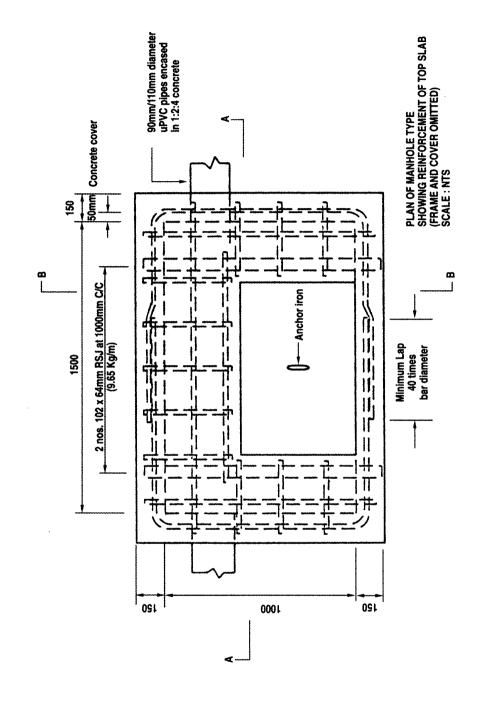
MANHOLE DRAWINGS - TYPE MX1
